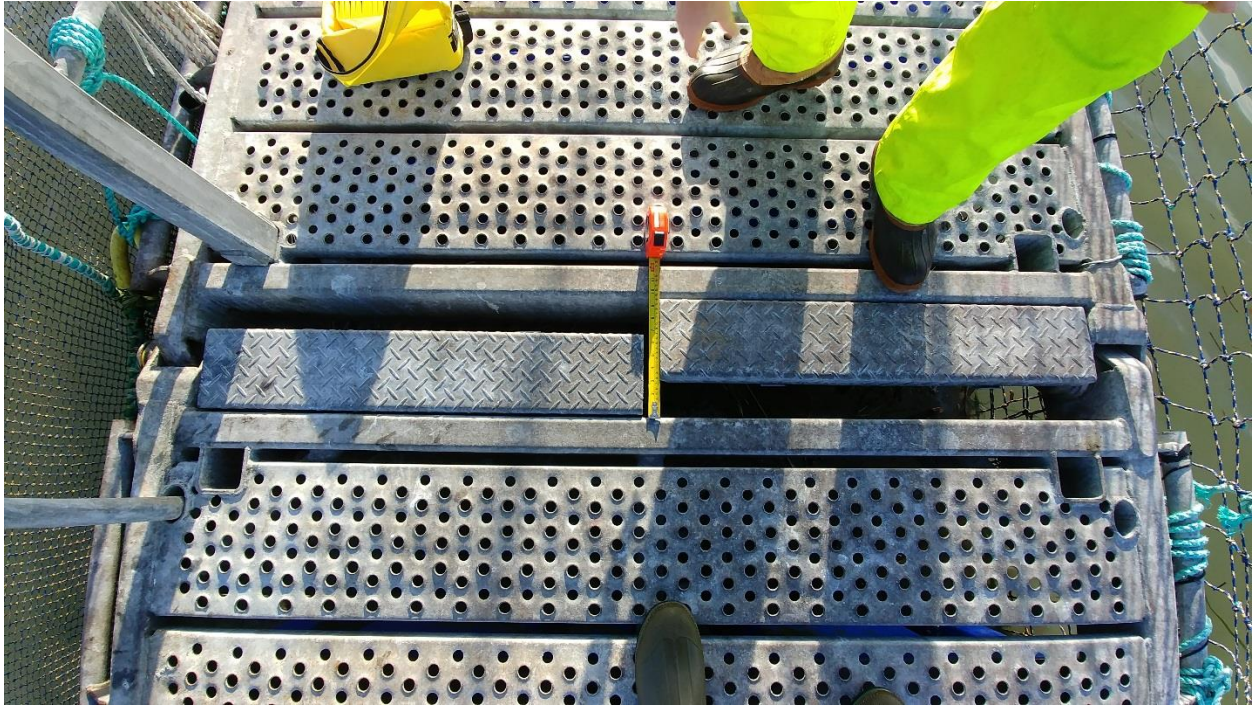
Cantilevered Transition Plates between Main Walkway Segments
